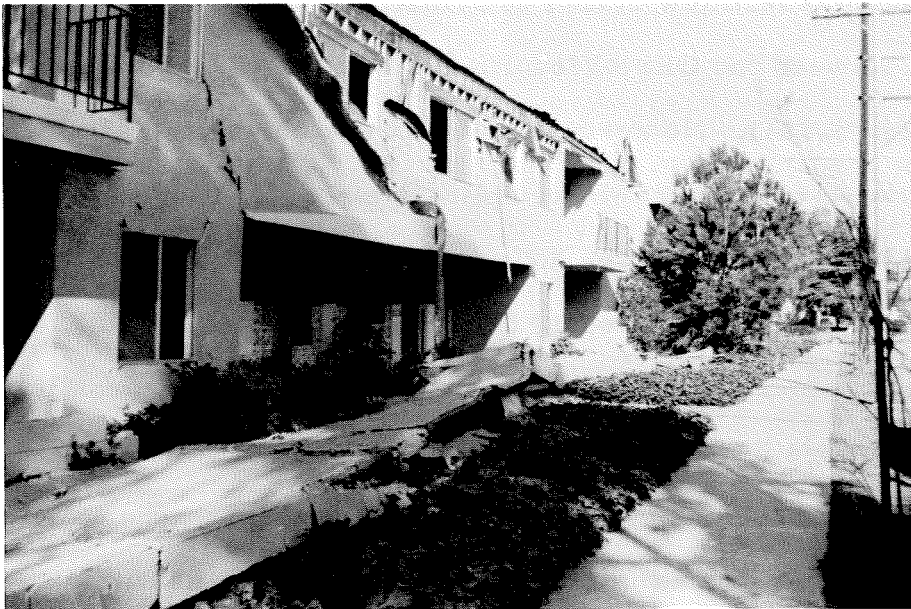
Mardette Apartment Buildings. Southeast building.
